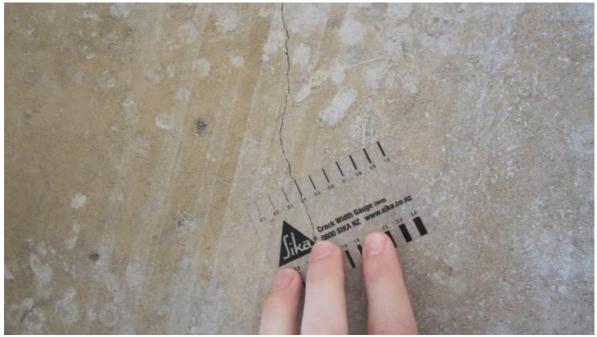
Precast reinforced concrete panel beneath stairs in Block B.Damage Description: Cracking of precast reinforced concrete panel. (0.4mm crack width)
